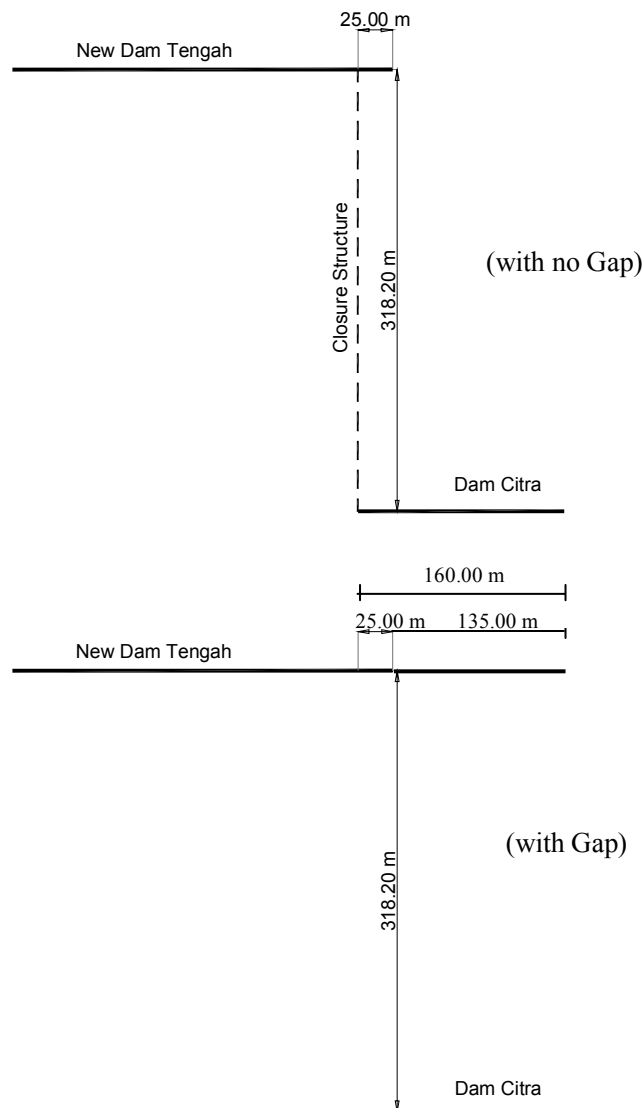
Alternative Breakwater Configurations of New Dam Tengah
